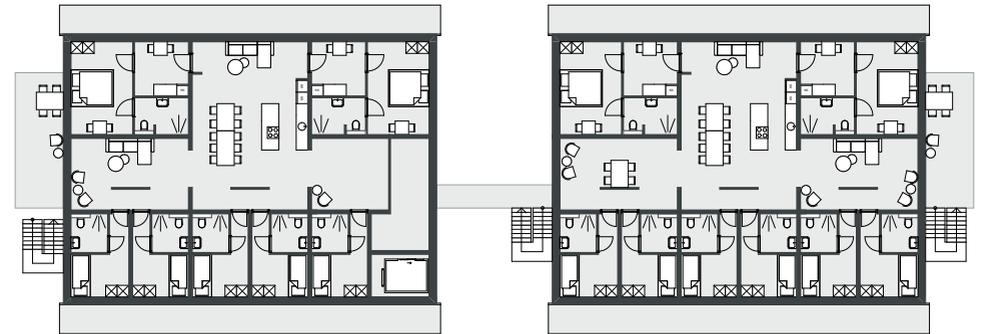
First 2nd floor, floor plan sketch of apartments in Building B
